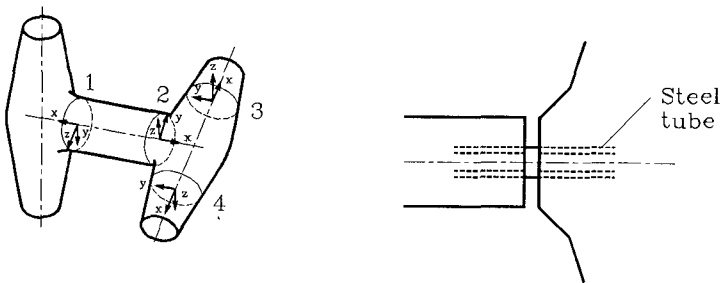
Instrumented sections. 200 kg concrete Dolosse, Aalborg Hydraulic Laboratory (AHL).
